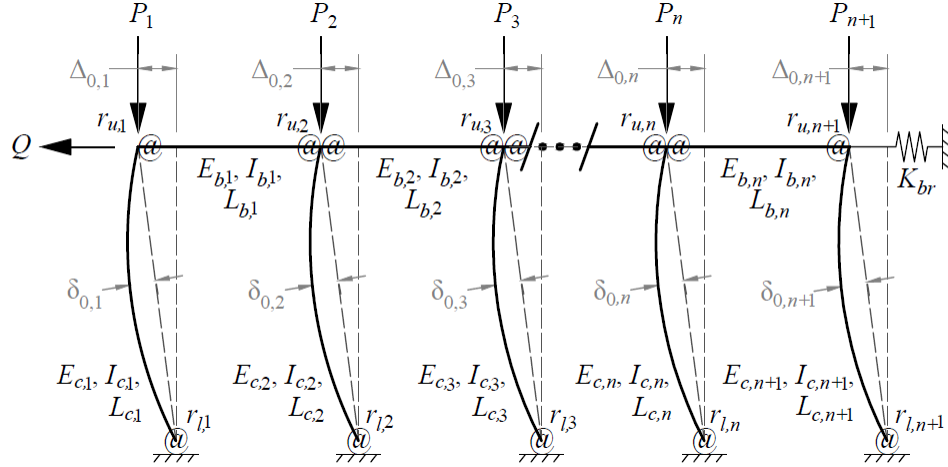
General semi-braced storey frame subjected to column imperfections and lateral load
